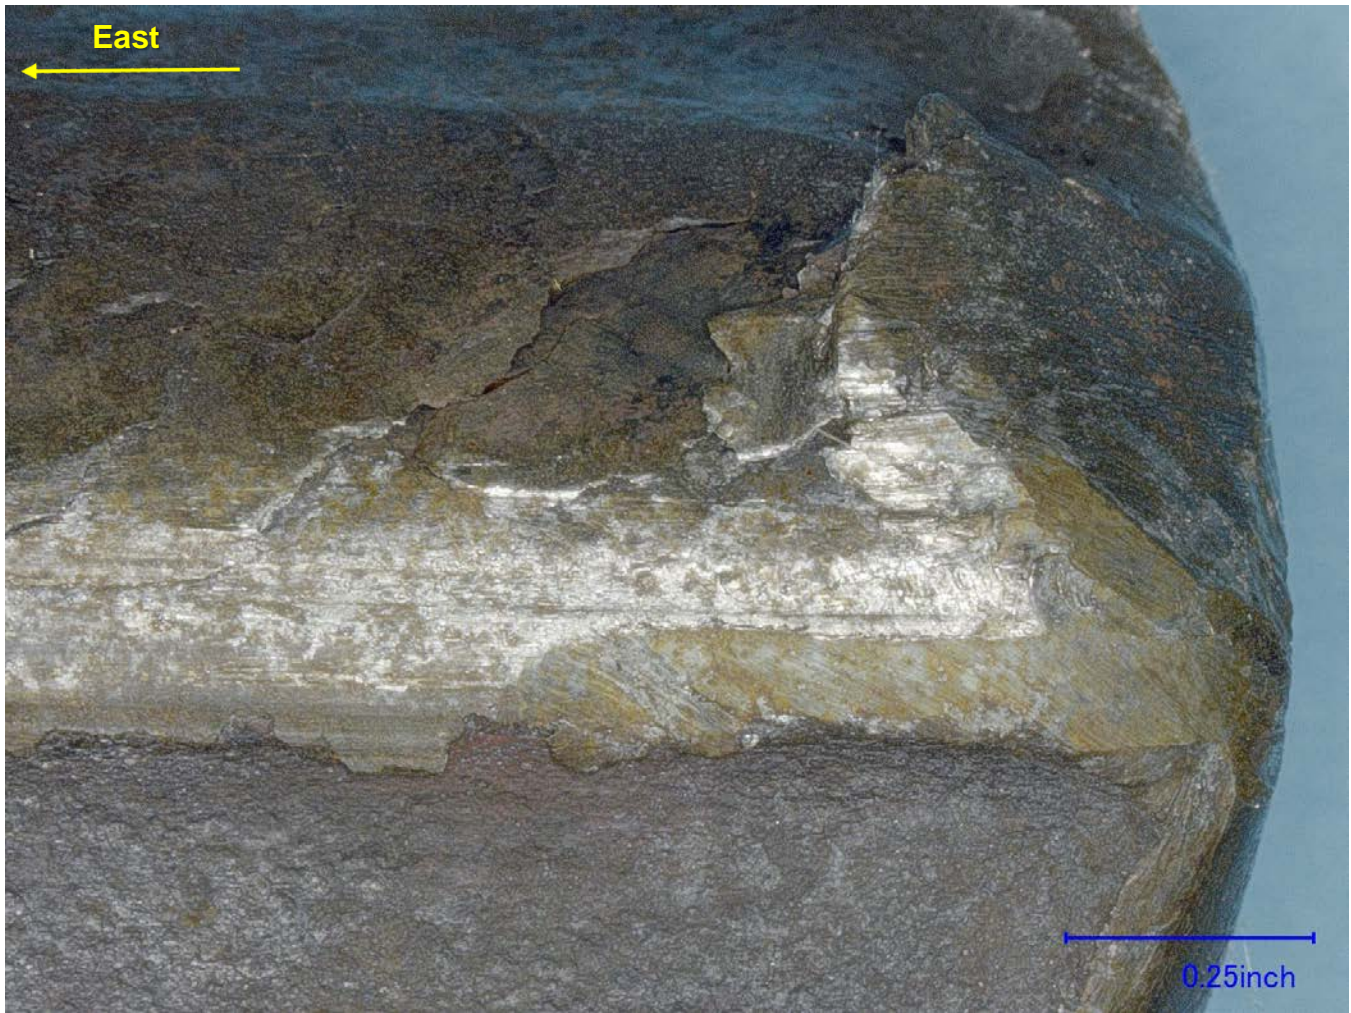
The gage side of the 10S fragment, showing the shelling damage and the fracture surface batter.
